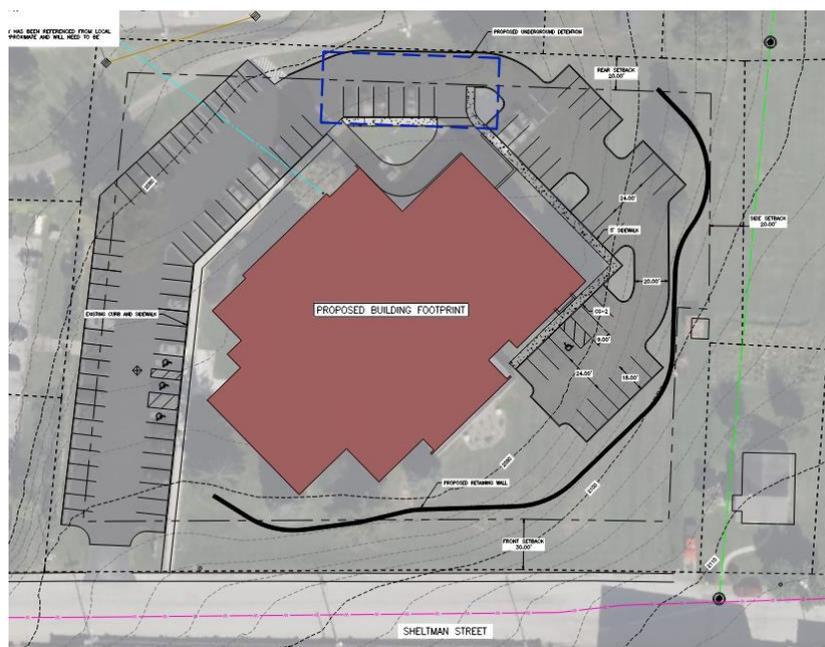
Conceptual Layout – Renovation and Addition Christiansburg Library
